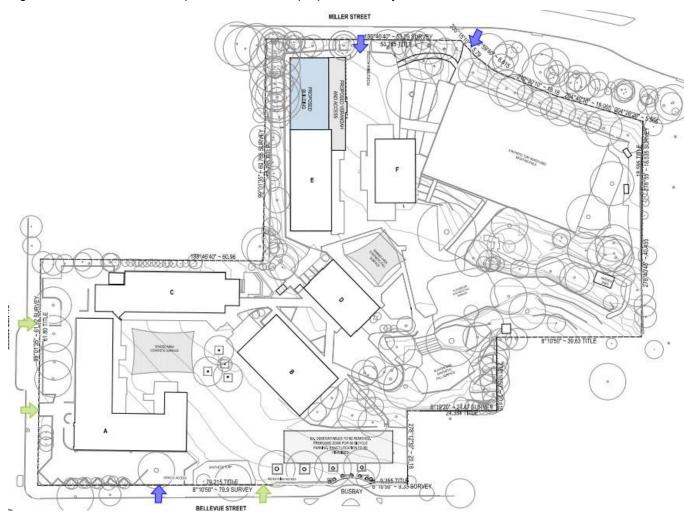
Proposed Scope of Works (Source: Fulton Trotter Architects, Proposed Site Plan (Rev P5))
